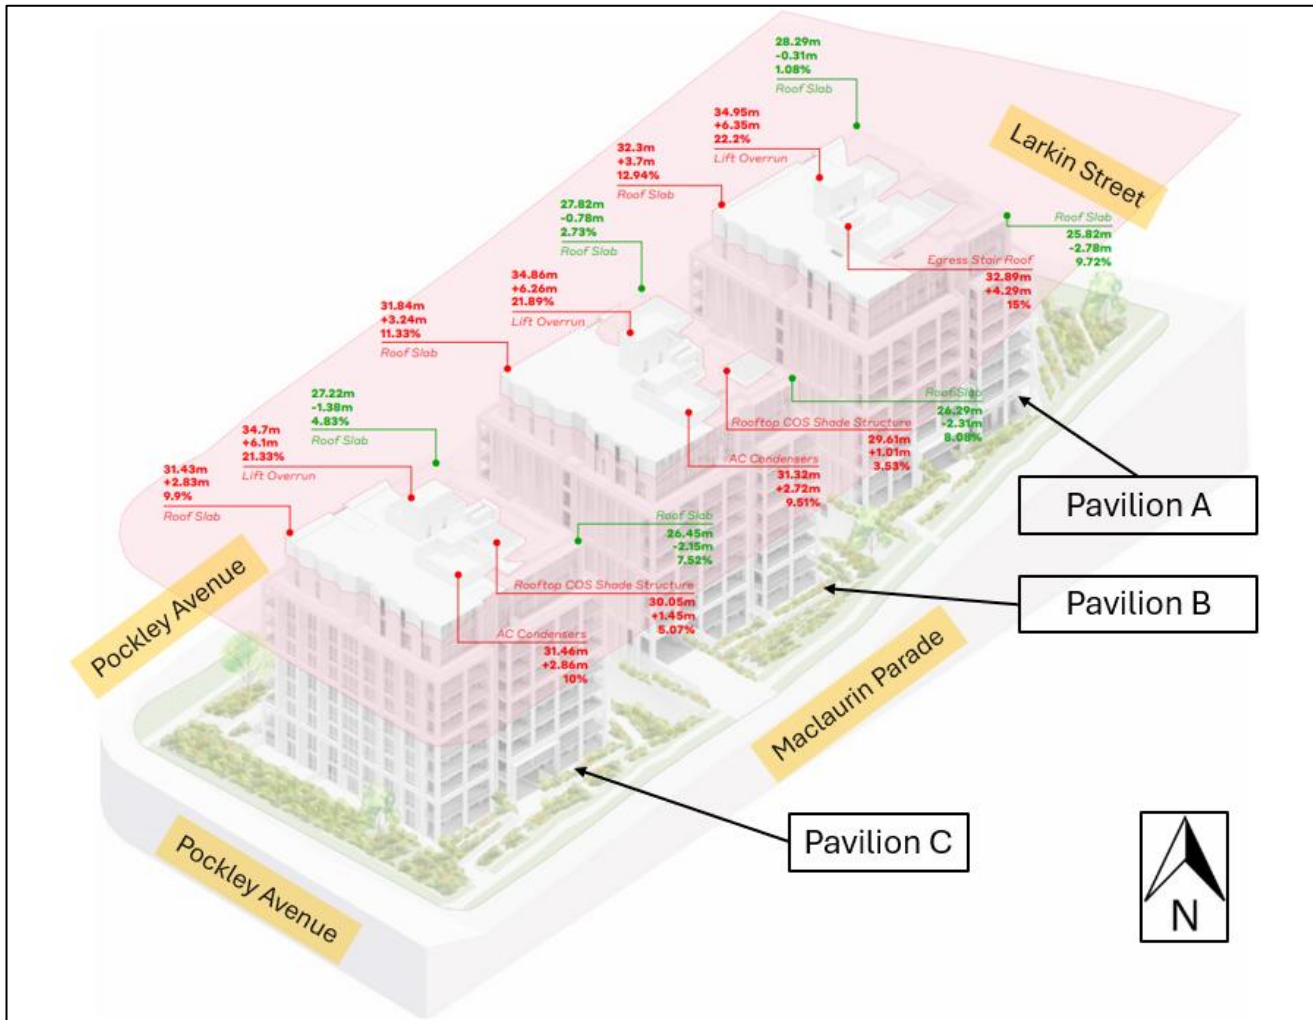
| Rooftop elements protruding above the maximum height plane (Source: Amendment report)
